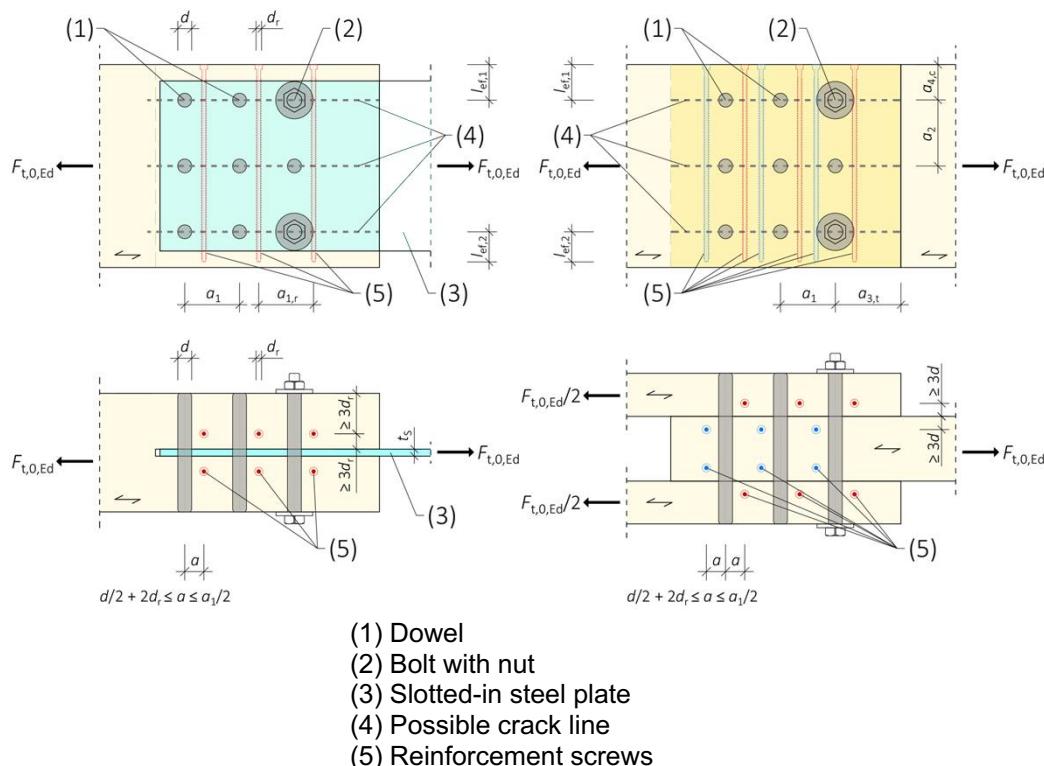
Dowel/bolt connection with reinforcement screws
